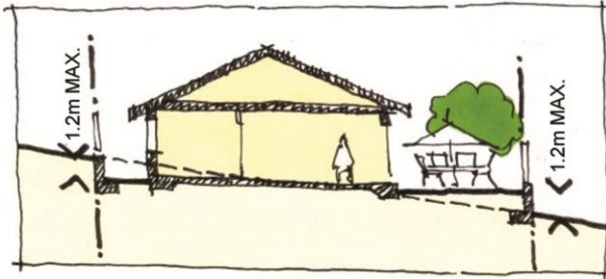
Retaining walls limited to maximum 1.2m height (4.2)
